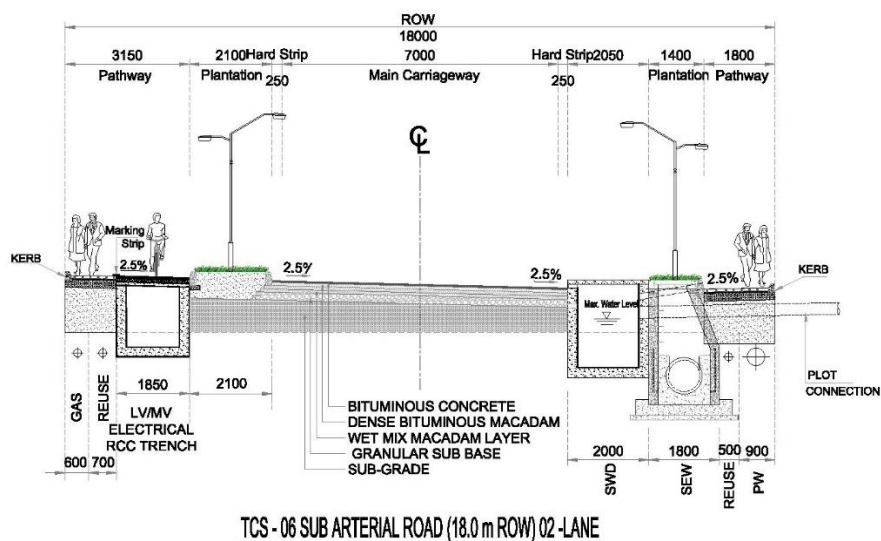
PROPOSED ROAD SECTION FOR KOPPARTHY INDUSTRIAL AREA 18M ROW
